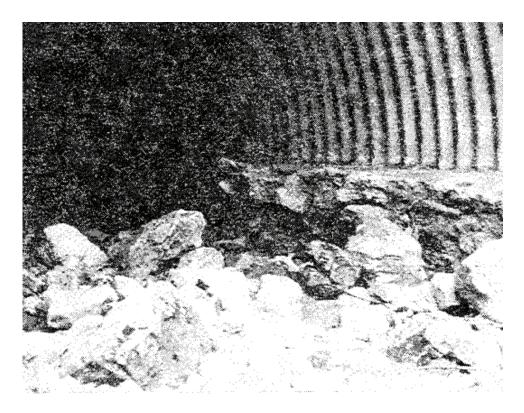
(Exhibit 78) Erosion of Invert Undermining footing of Arch
